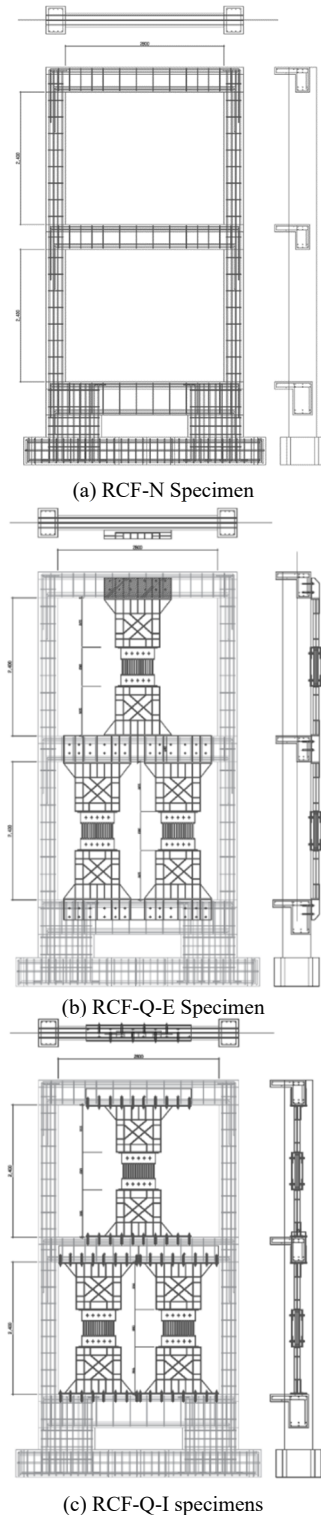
RC frame specimen and reinforced frame specimens strengthened by HSR damper.
